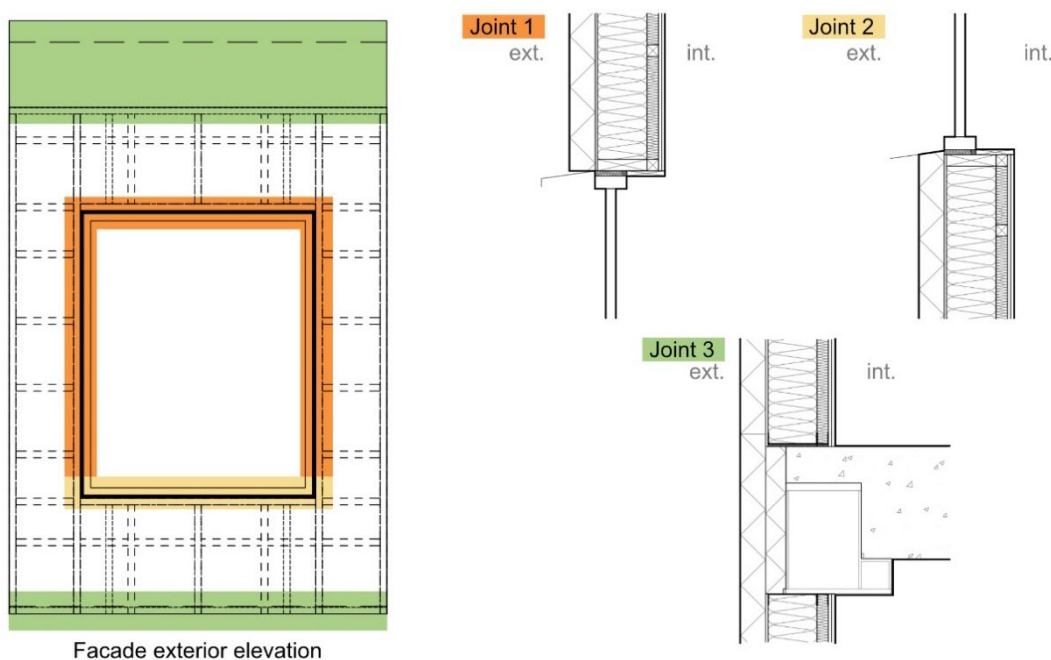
The wooden frame panel's joints shown on facade elevation and its detail.
